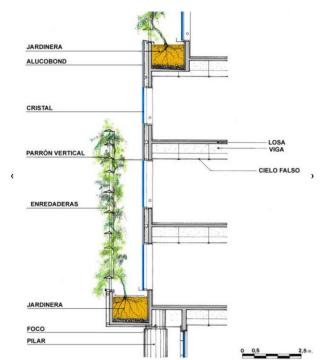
Detail of wall section also showing the structural connections between plant stand, planter and building (Pastorelli, 2009)
